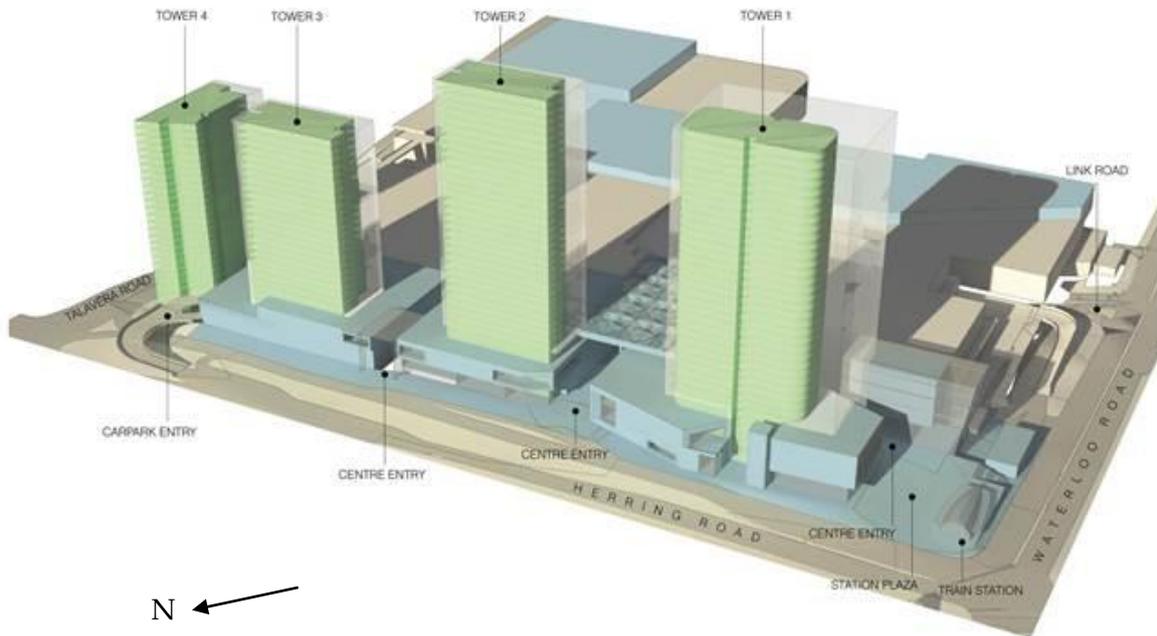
Overview of the plan with Tower 1 as a residential tower (green) and as an office tower (shaded)
